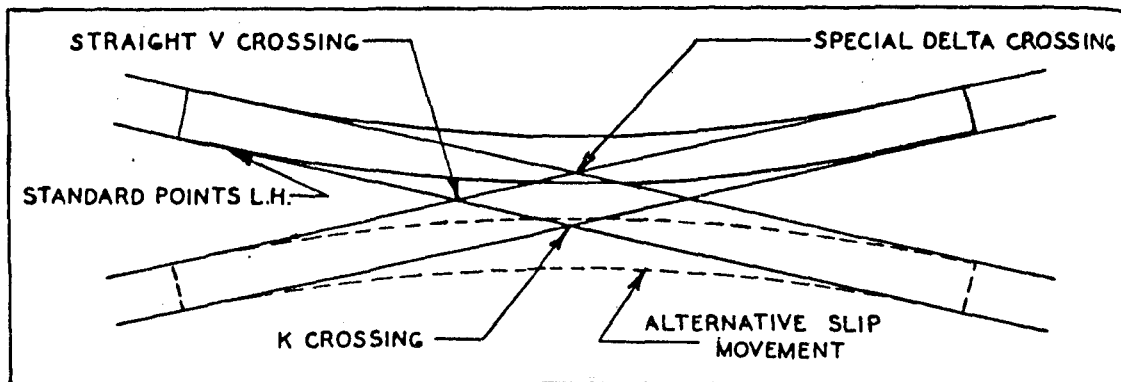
THE OUTSIDE SLIP USING A SPECIAL DELTA CROSSING
